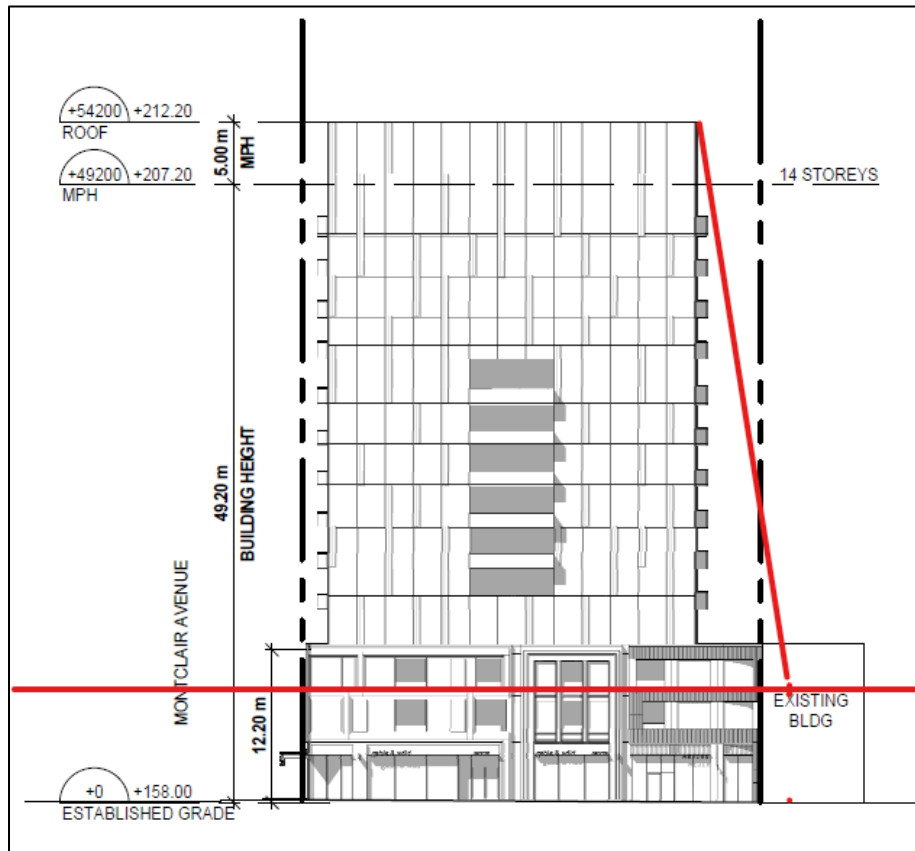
North Elevation of Proposed Development Illustrating Severe Obstruction of Sky Views from Forest Hill Apartments
